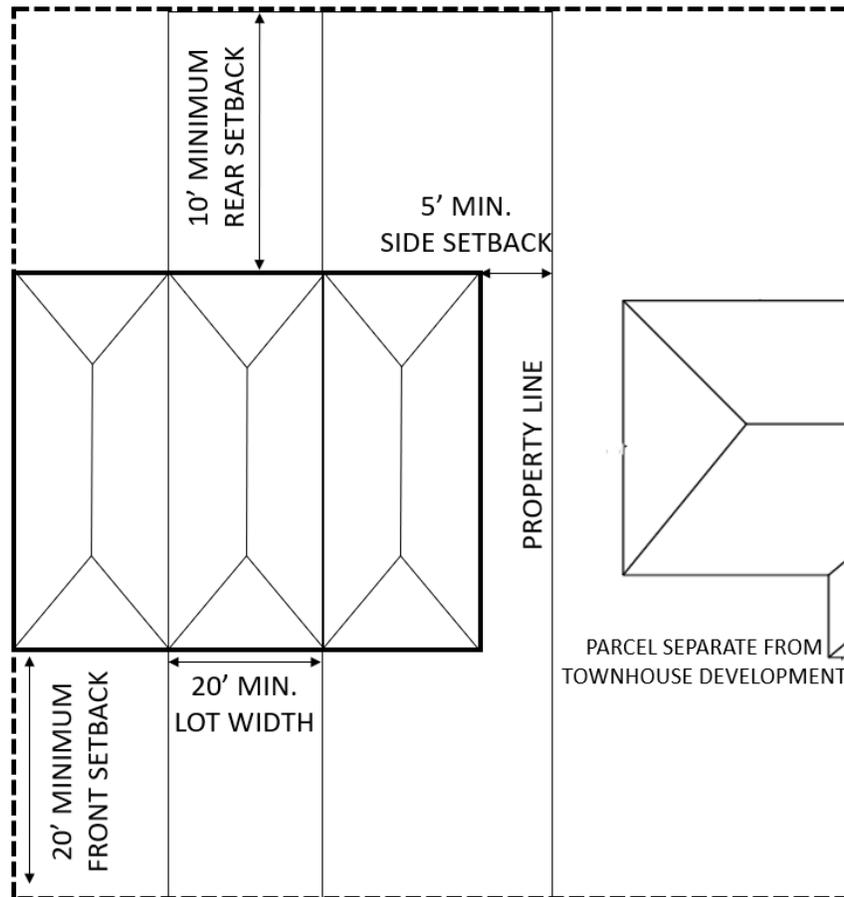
Minimum Building Setbacks for Townhouse Structures Abutting Parcels Outside of the Associated Development
